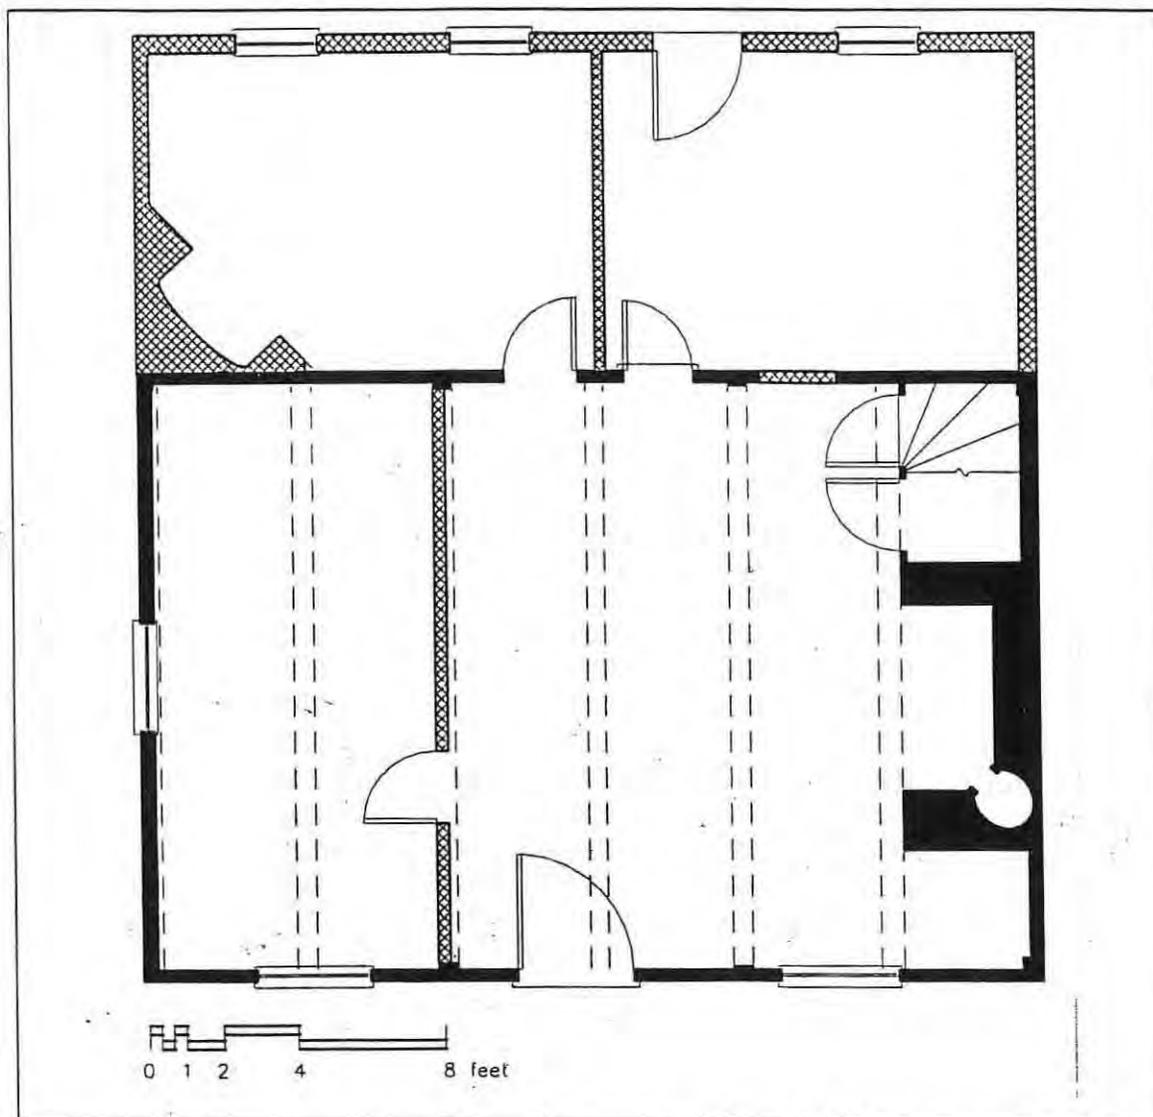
Dutch House. First floor plan, period II, c. 1725–c. 1760.
